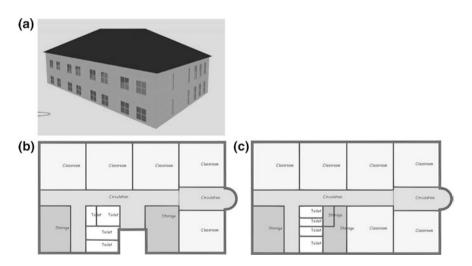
School building model: a tri-dimensional overview; b ground floor; c first floor
